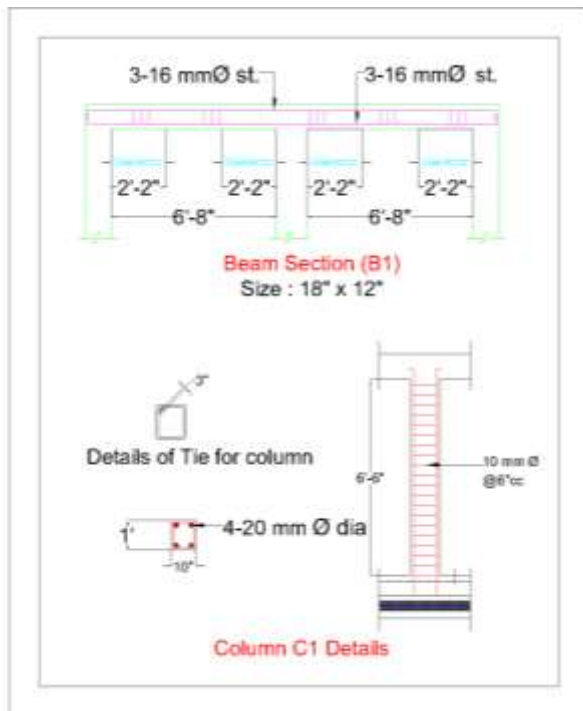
Beam and column sections for medium Community-scale tank for 50 households
